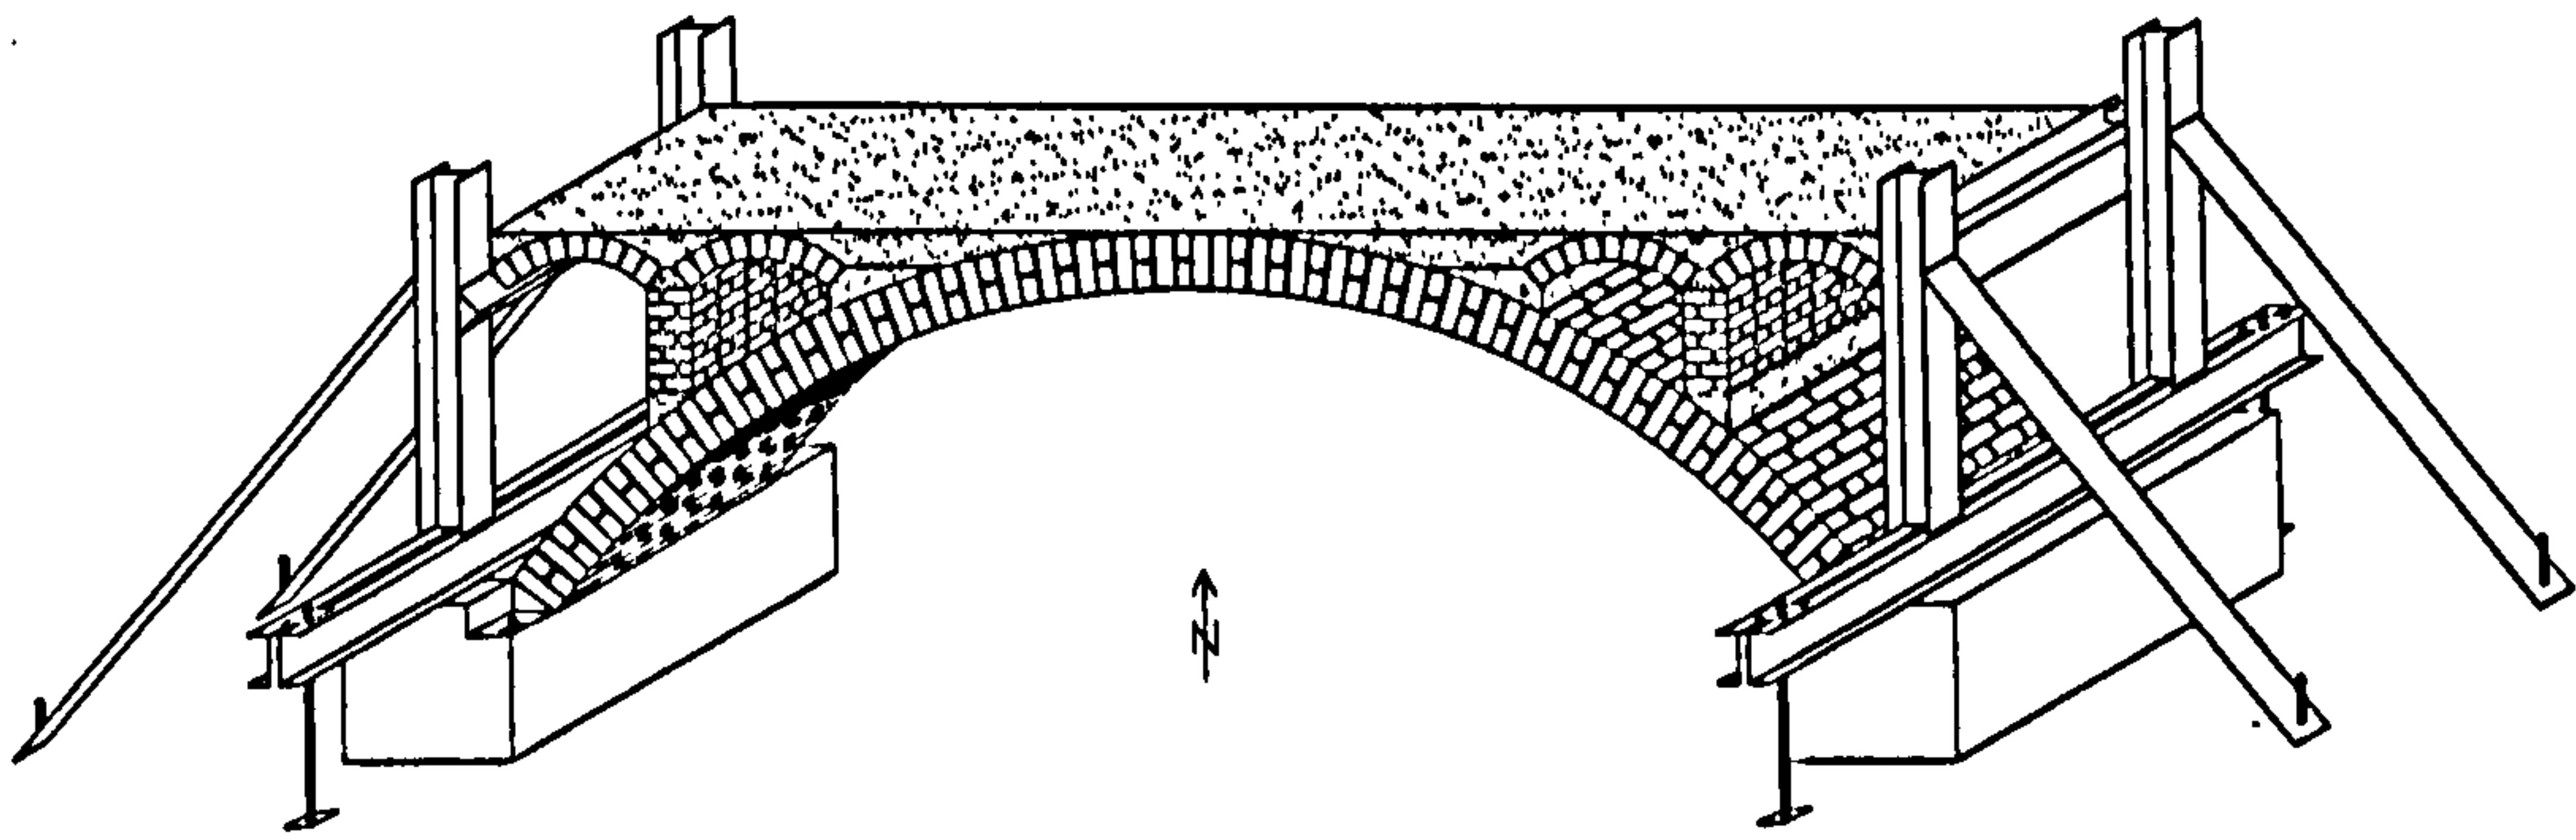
Open Spandrel Brickwork Model Arch Bridge
